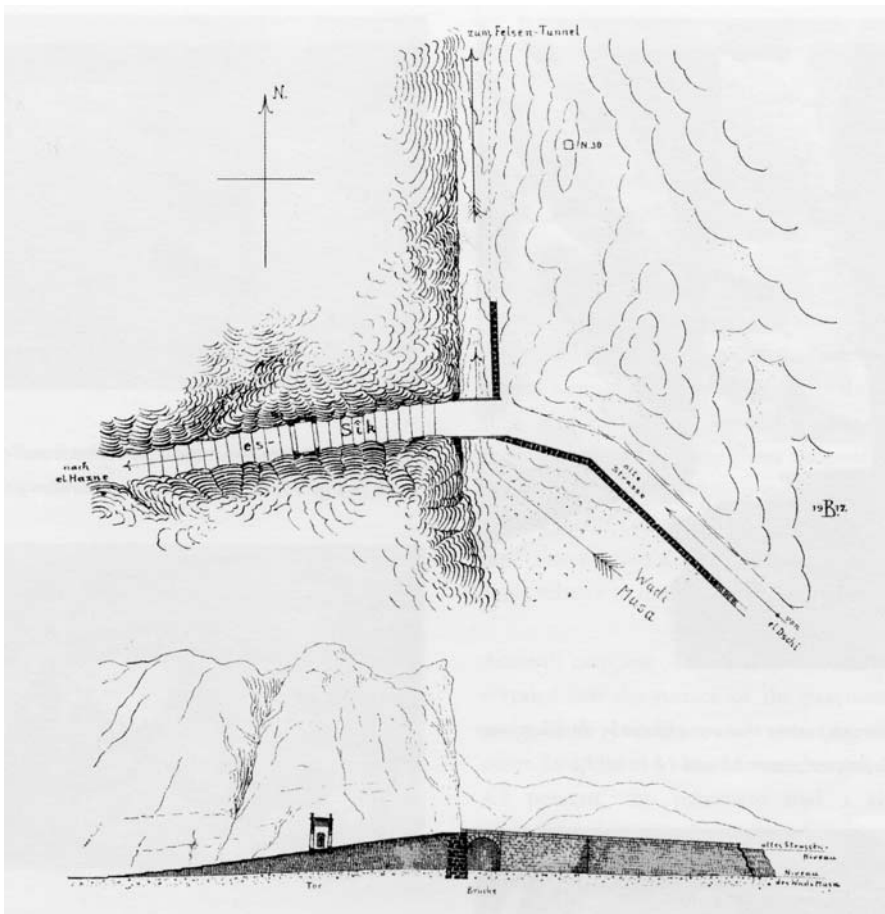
W. Bachmann’s 1917 reconstruction of the situation at the entrance to the Siq, with the plan above and the elevation below. (Bachmann et al., 1921)
